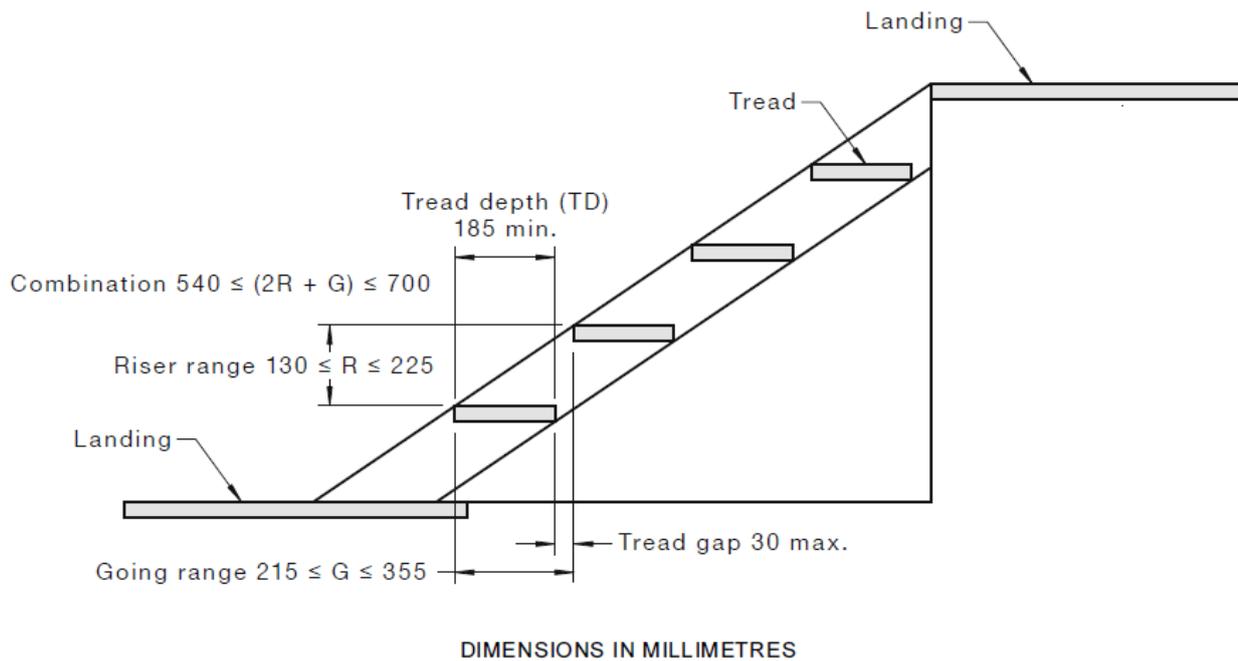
TYPICAL STAIRWAY TERMINOLOGY
